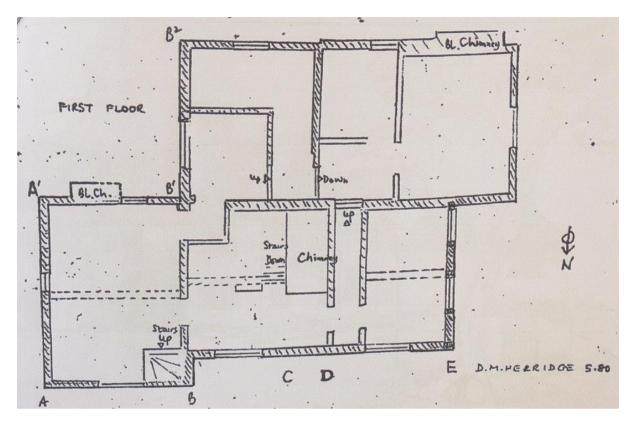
A sketch plan of the first floor in 1980 (DBRG (Surrey report no.2398)
